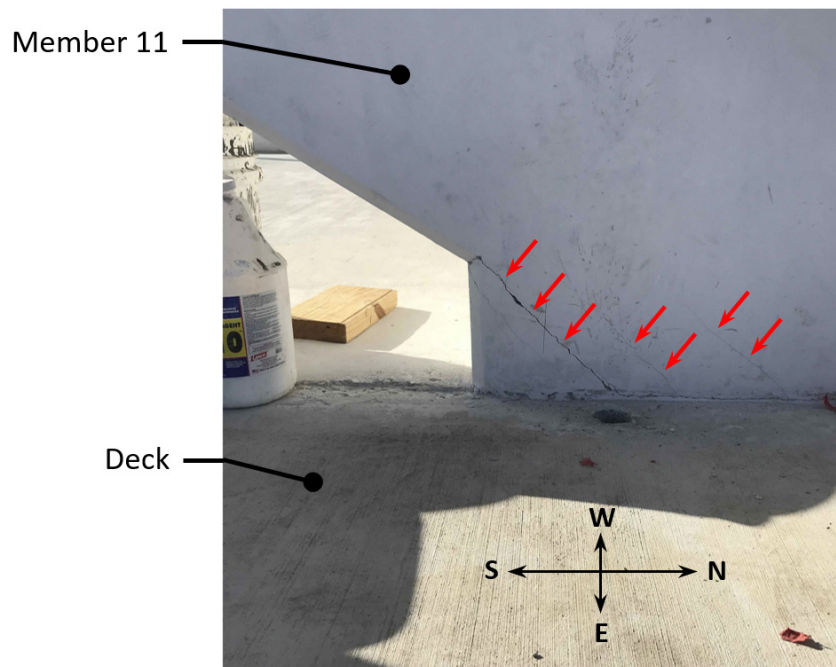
Photograph showing cracking at southeast corner of truss member 11 near where it met the deck. Captured on February 26, 2018 at 8:38 a.m. Corresponds to Bridge Factors Factual Report Photo 42.
